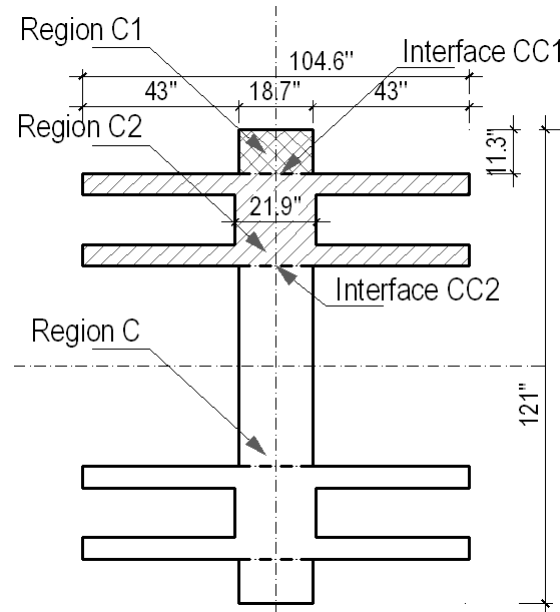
Homogenized equivalent concrete section b_s – Example 1
